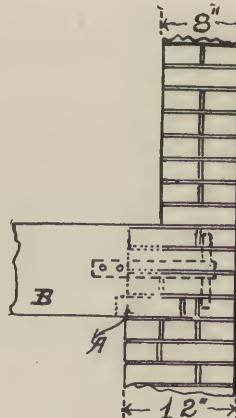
12 AND 8-IN. WALLS ANCHORED.
